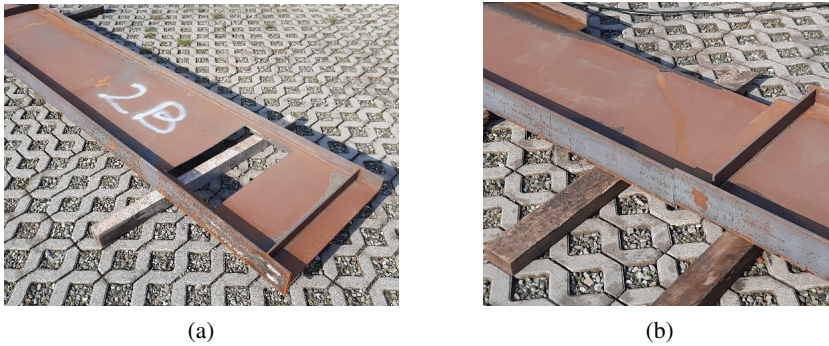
Sections of girders made of S235JR steel cut for further testing:
